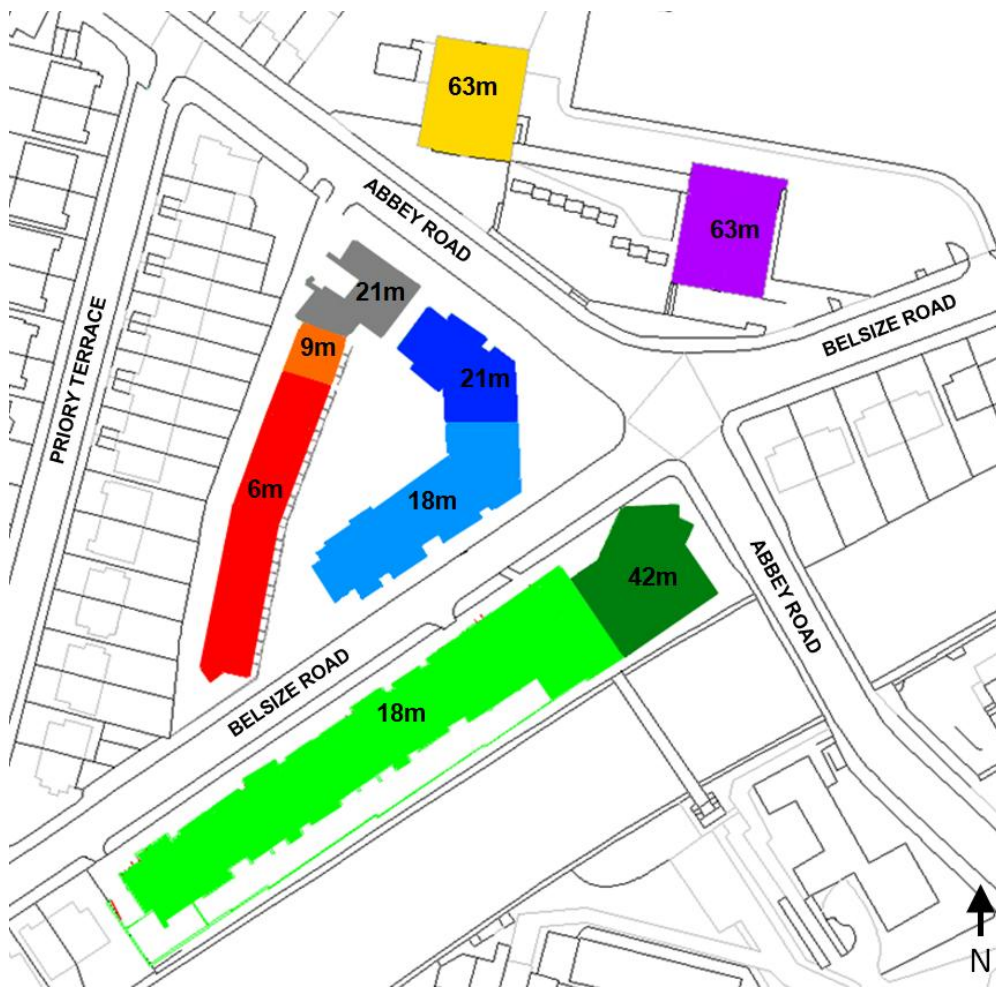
Abbey road regeneration site, proposed new buildings with elevations.
